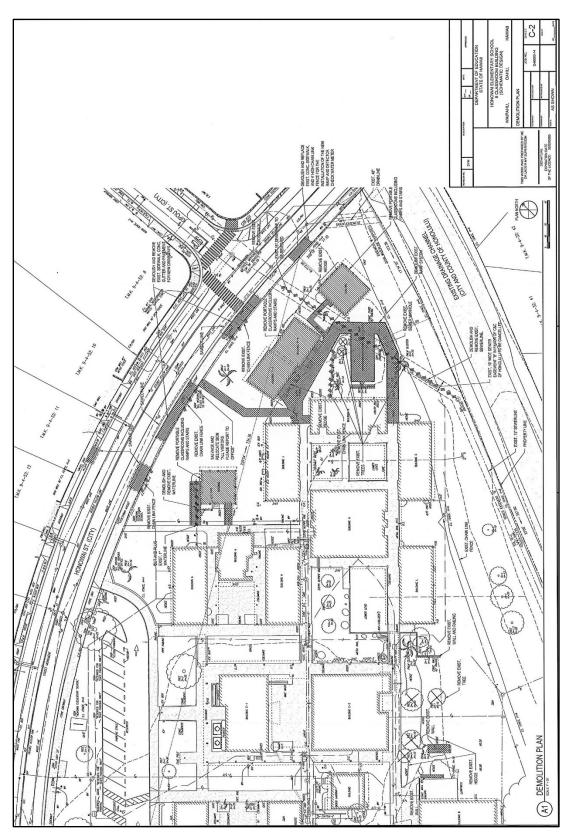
Demolition plan for the Honowai Elementary School Eight-Classroom Building project (courtesy of client)
